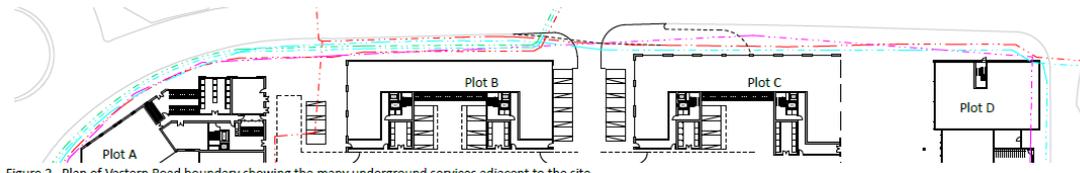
Plan of Vastern Road boundary showing the many underground services adjacent to the site
